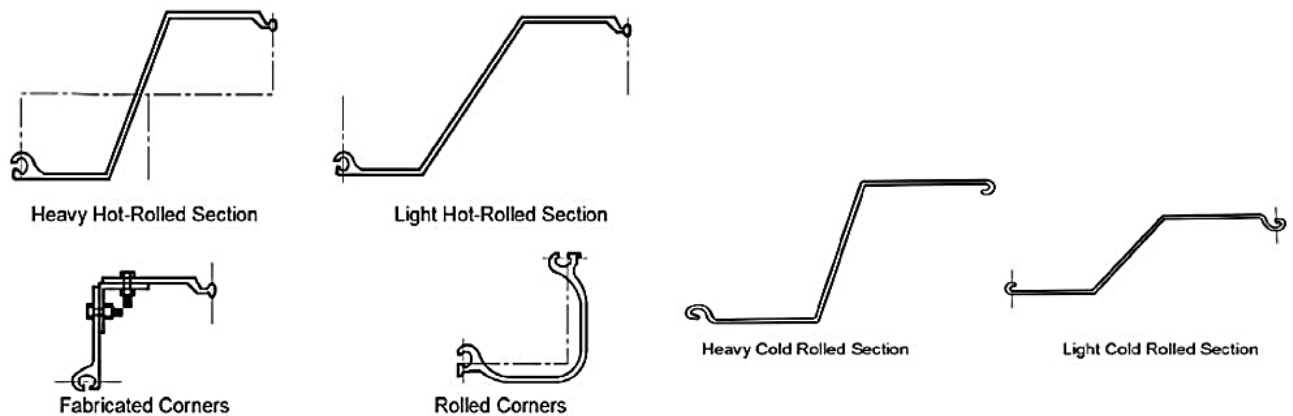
R-4. Typical Steel Sheet-Piling Shapes
